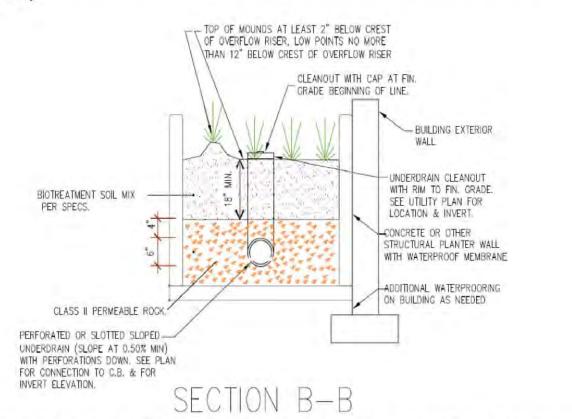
Cross section B-B of flow-through planter, shows cross section of underdrain
